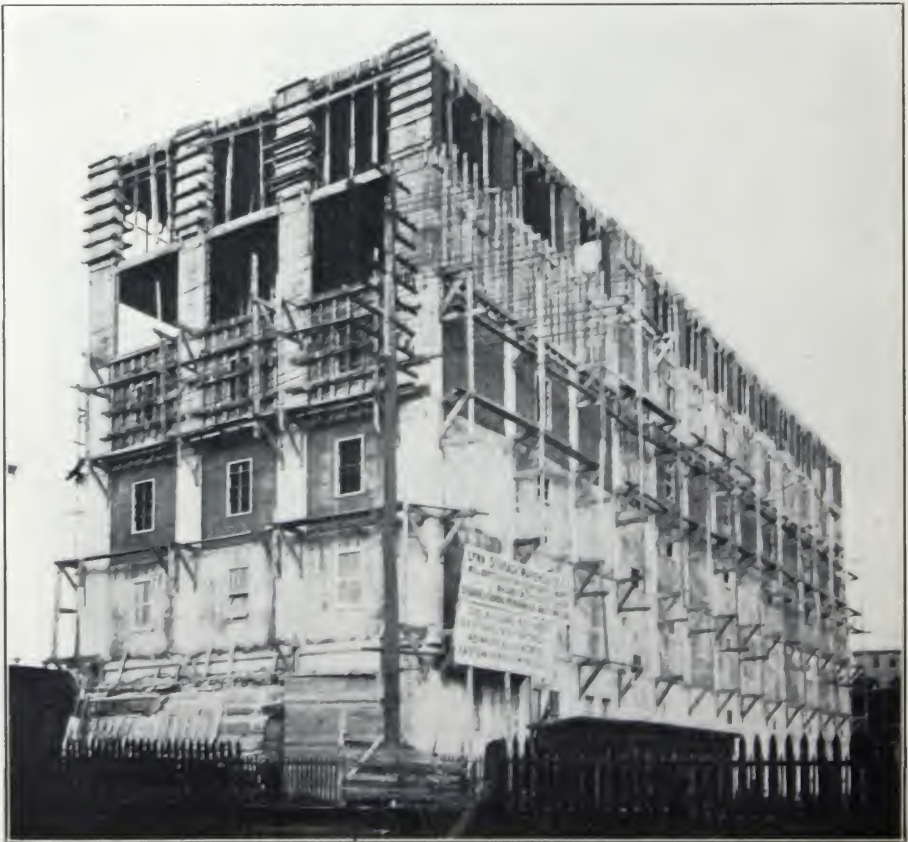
Panel Form Construction in Storage Warehouse, Lynn, Mass.
